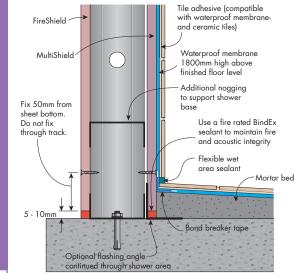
Wall Base in Wet Areas (Outside Shower) With (Class 2) waterproof membrane as flashing
